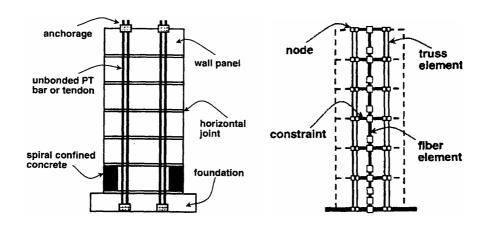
Unbonded wall system: scheme and fibre element model [Kurama et al., (1999)]
